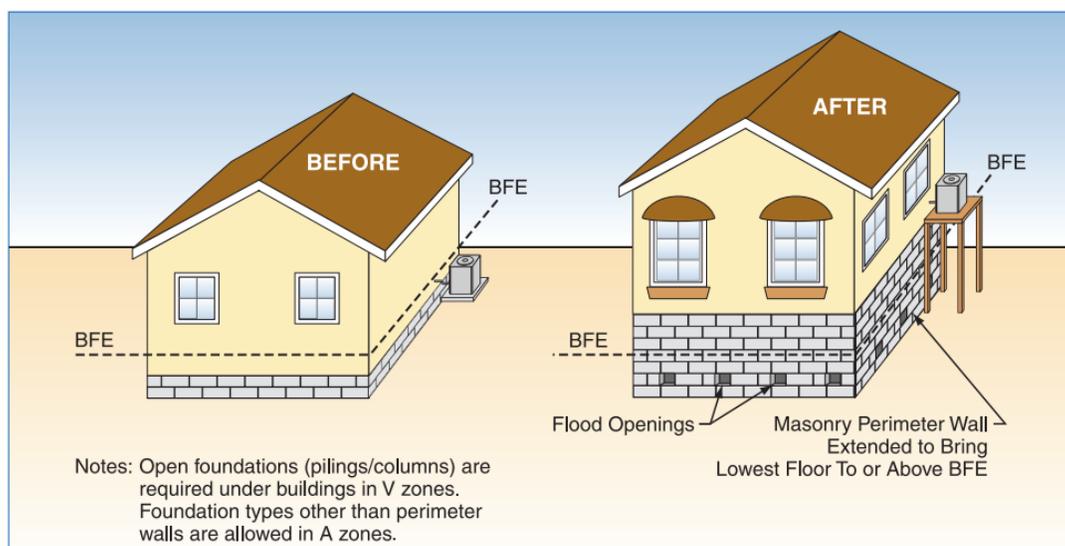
Depiction of Elevation and Floodproofing as part of Substantial Improvements.
